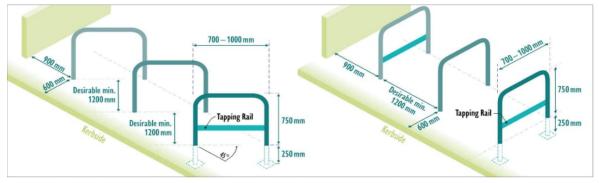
Typical Layout of Sheffield Stands (Source: Cycling by Design)
